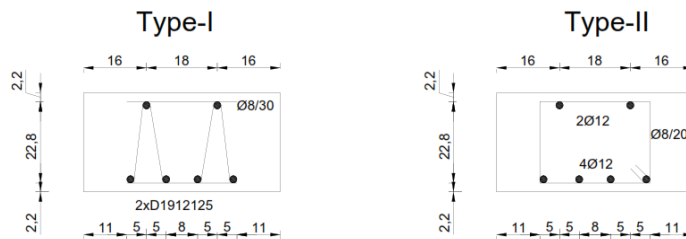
Reinforcement arrangement of tested beams (Dimensions in mm)
